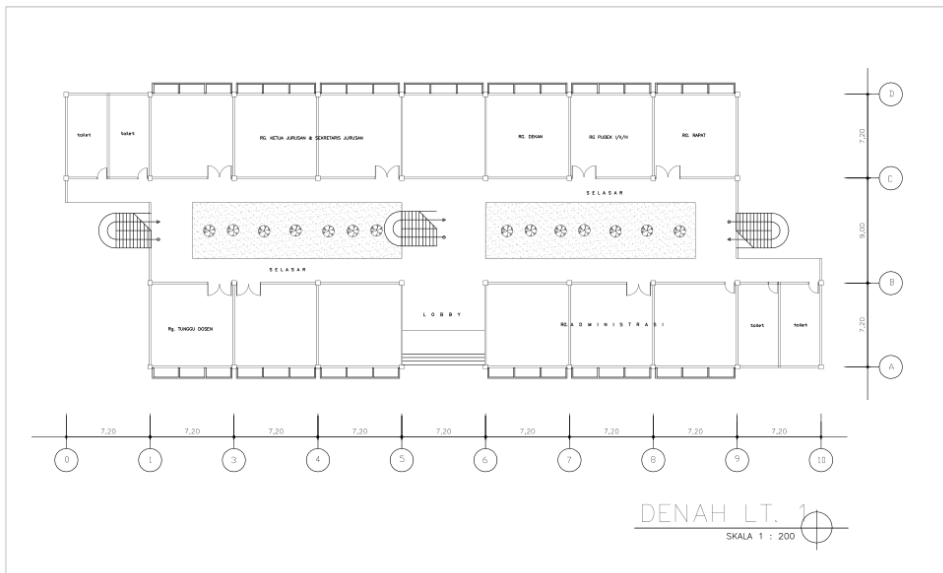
Schematic Trailer of the UNKRIS Faculty of Engineering Building which will be used in crowd modeling.
